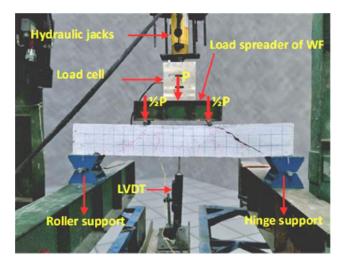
Test arrangement of bamboo-reinforced concrete beams.
